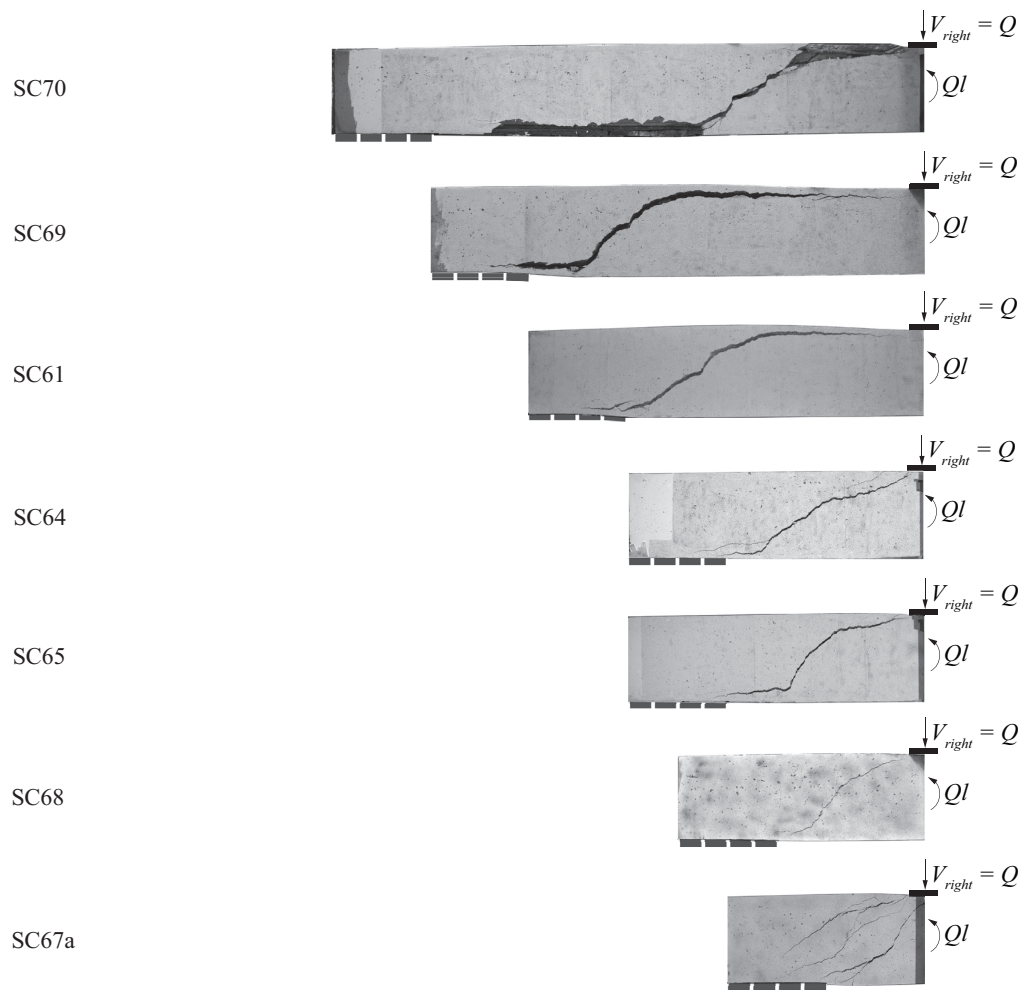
Photos of crack pattern after failure: cantilevers subjected to point loading.
